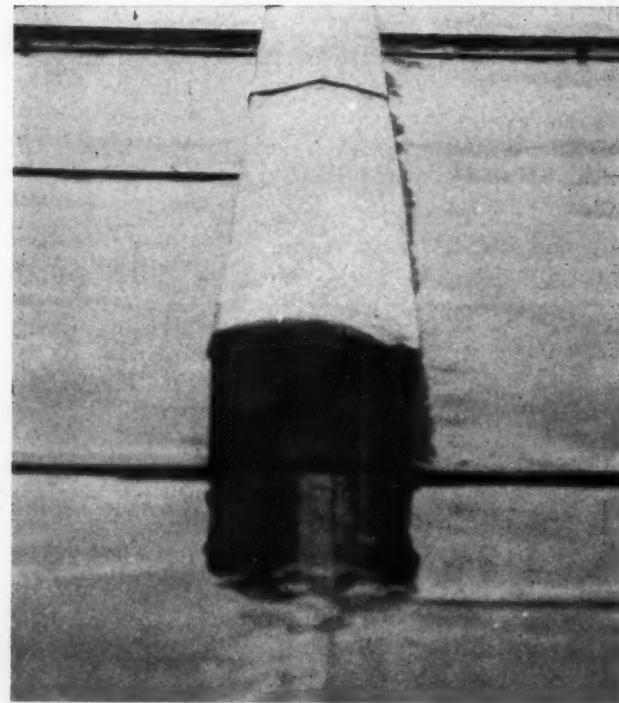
Reconstruction of Photo 2 shows the loose lock between gutter and slope and the batten extended to the end of the slope, eliminating much soldering and many small pieces.
